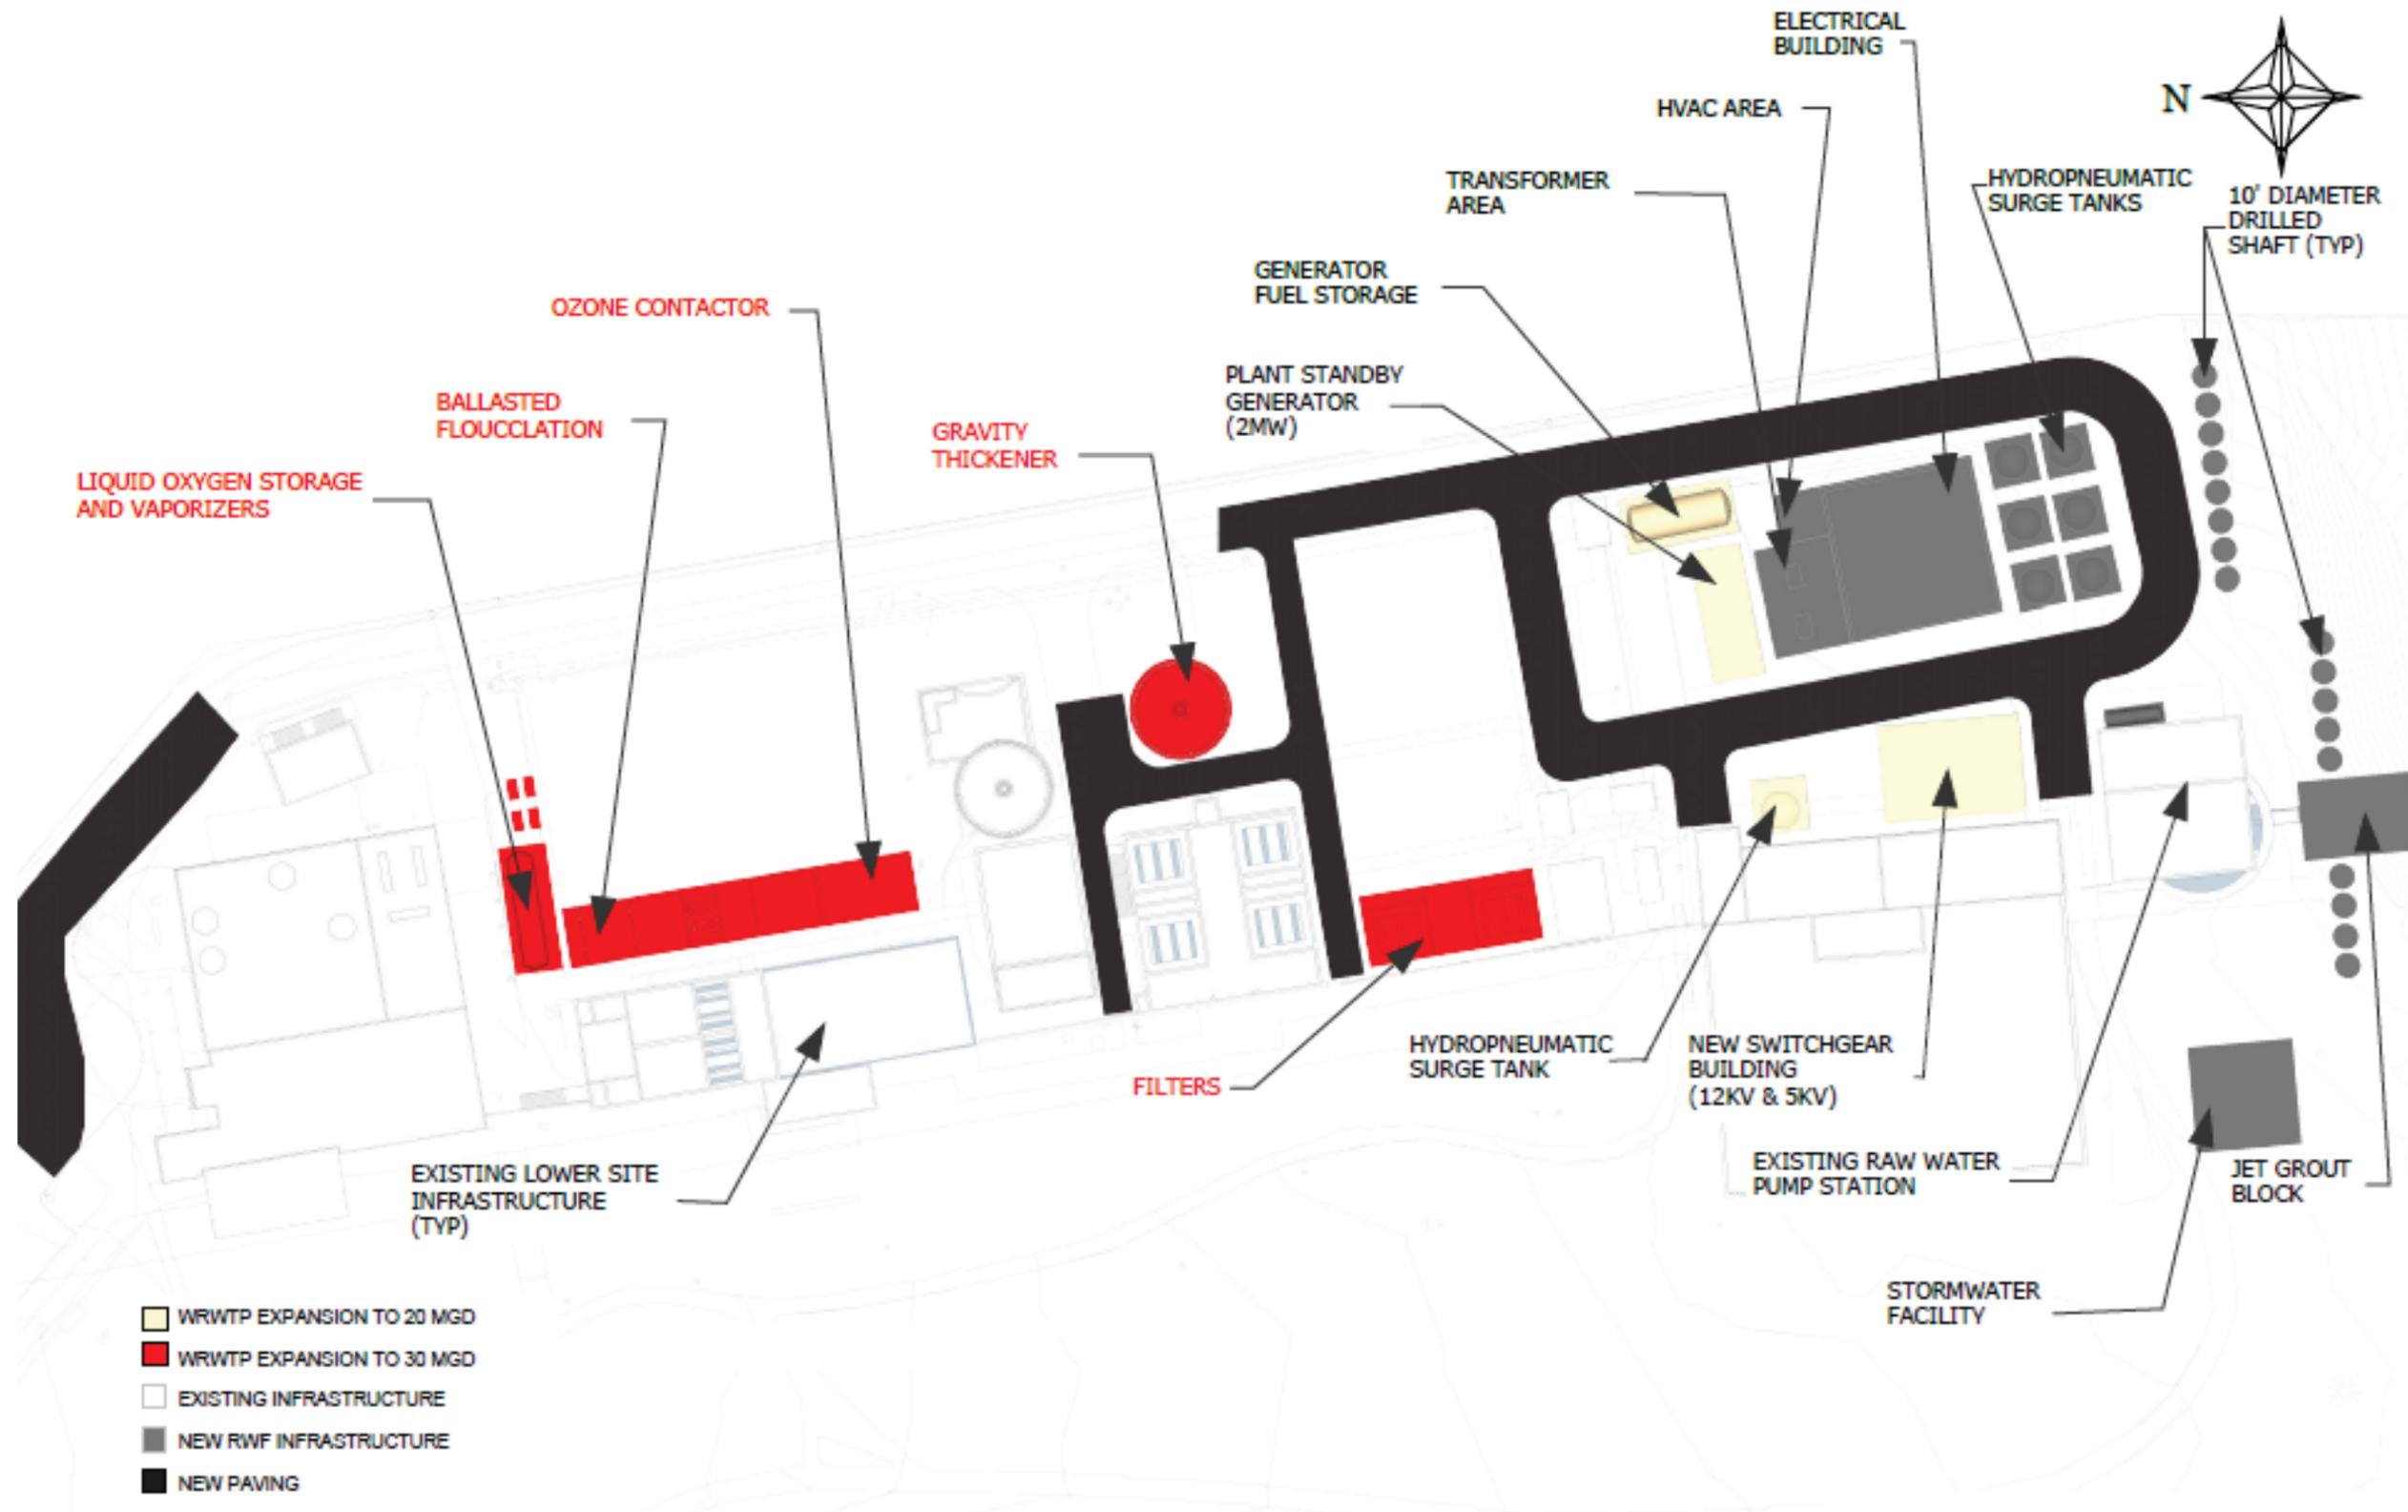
Site Plan – 30-MGD Capacity Expansion
